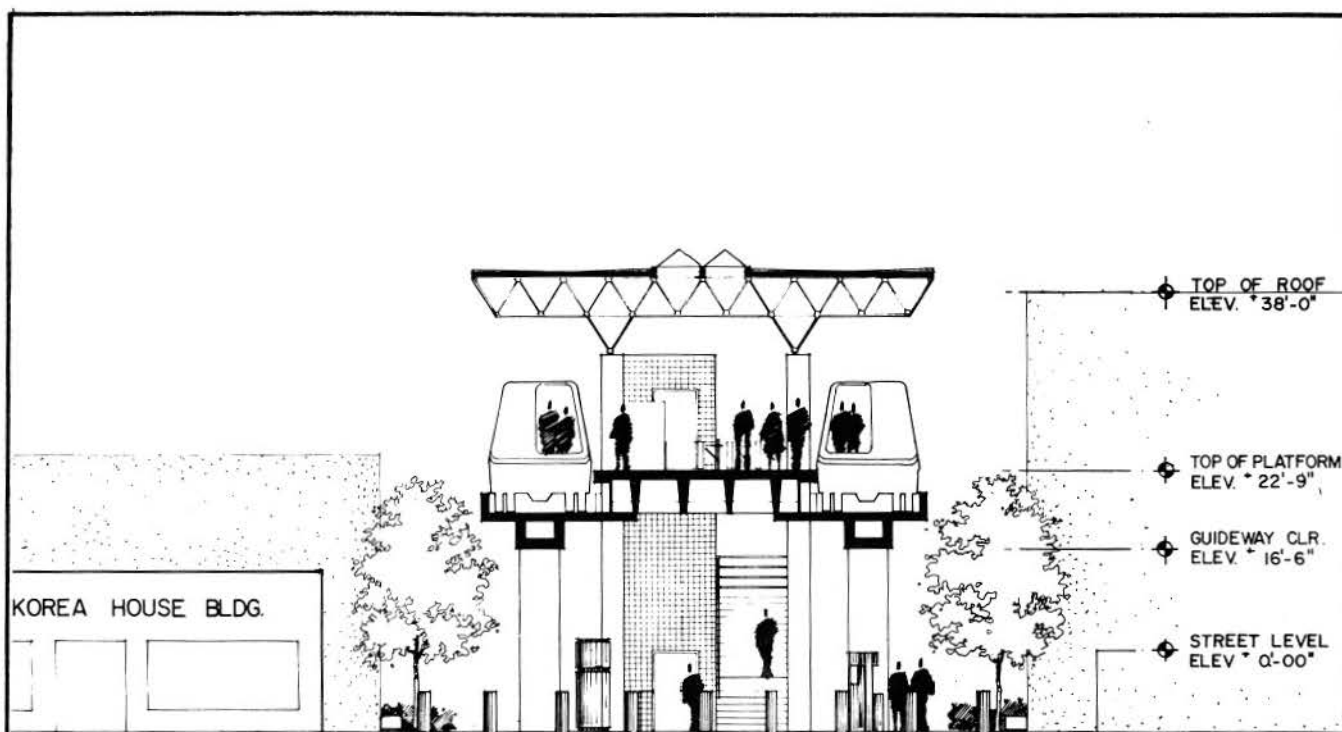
CROSS SECTION AT STATION 'E' LOOKING SOUTH
